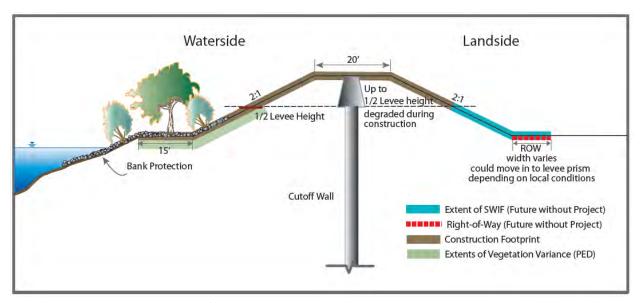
Fix-In-Place with Cutoff Wall and No Levee Raise.
